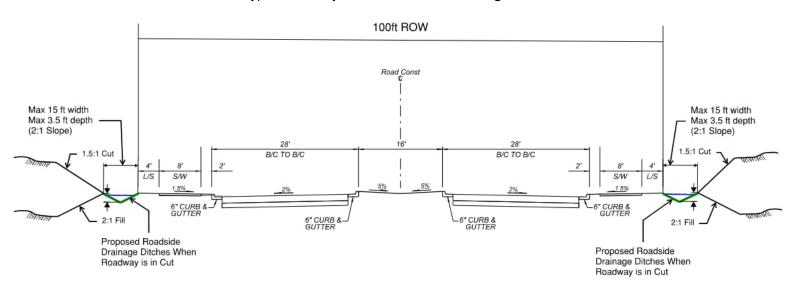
Proposed Typical Roadway Section with Roadside Ditches
